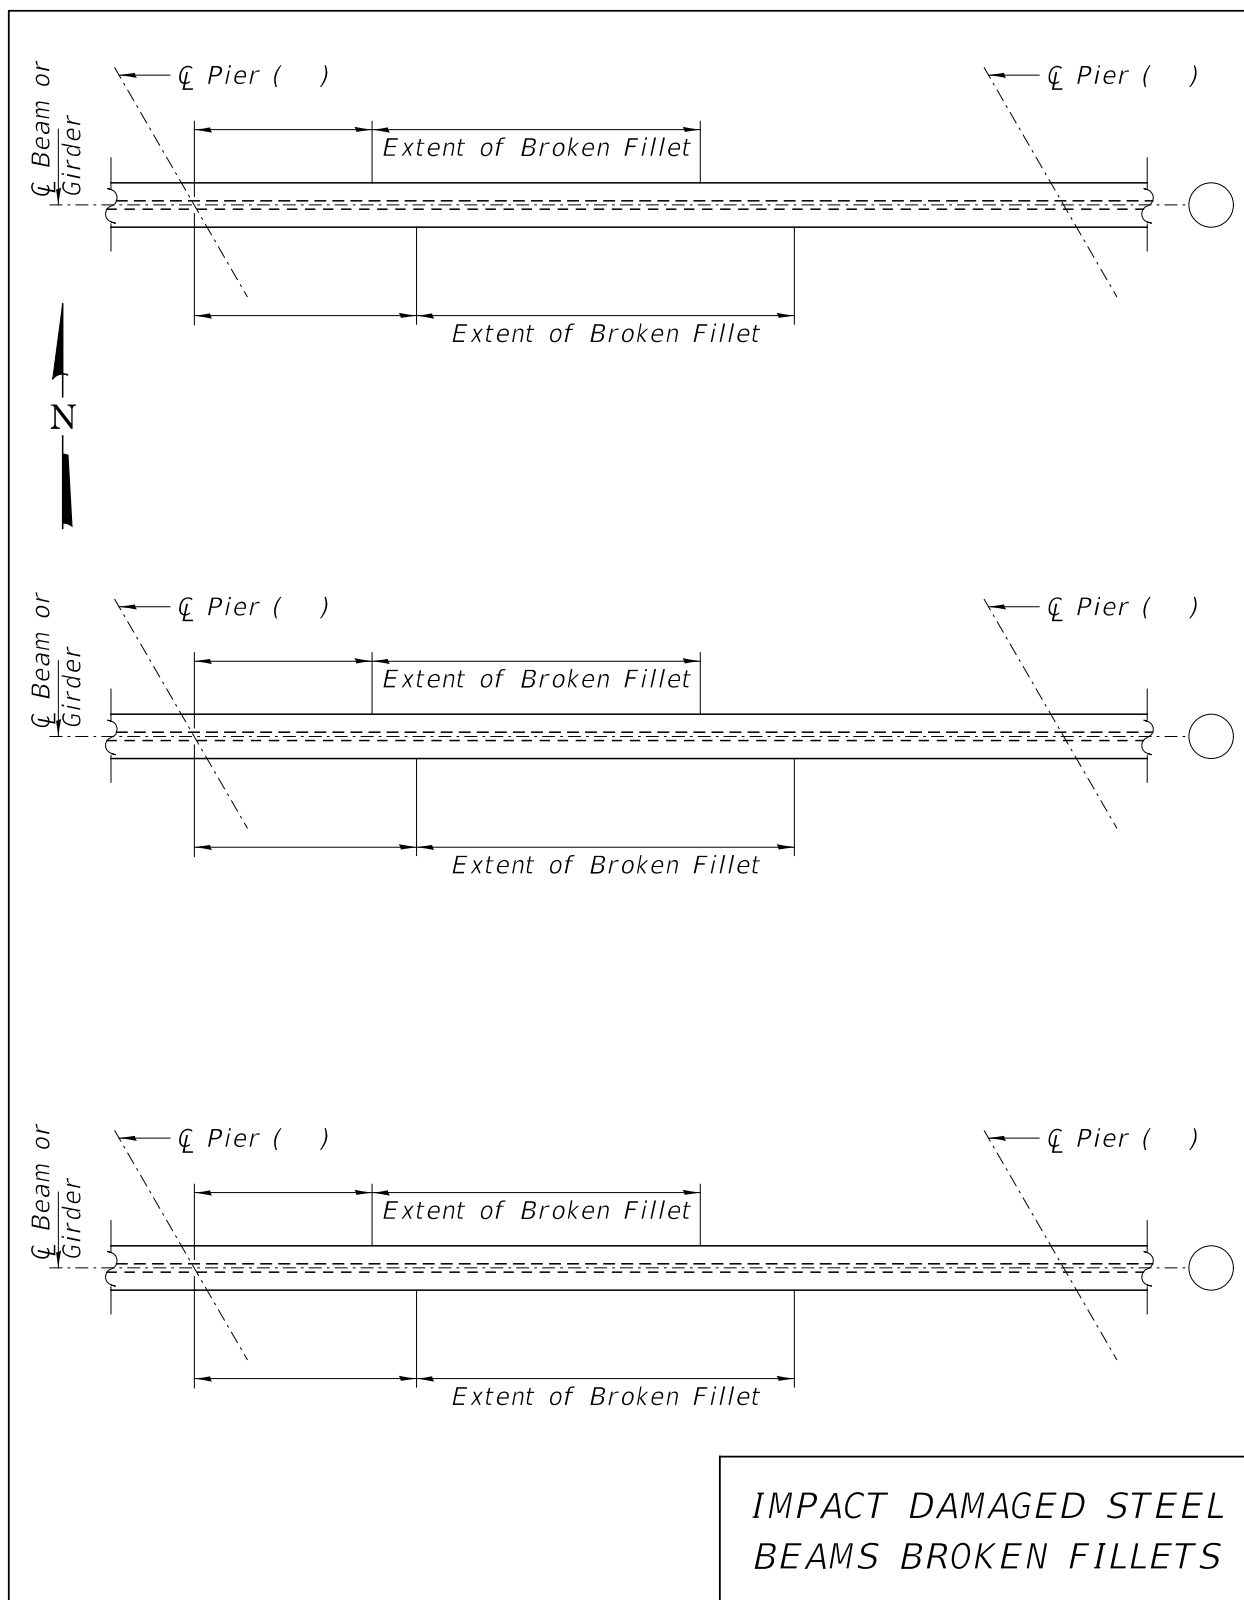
Impact-Damaged Steel Beams – Broken Fillets
